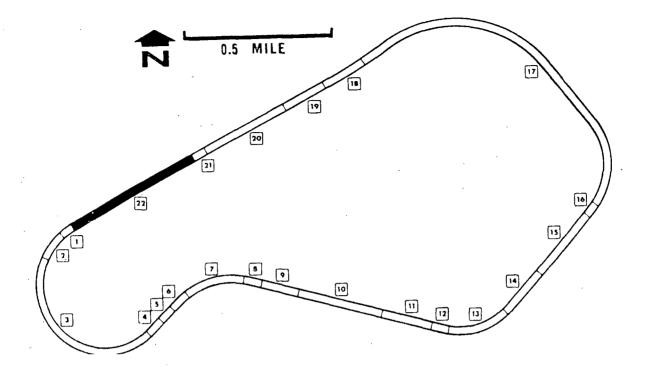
FAST Track Loop: The FAST Track layout with Section 22 identified.
